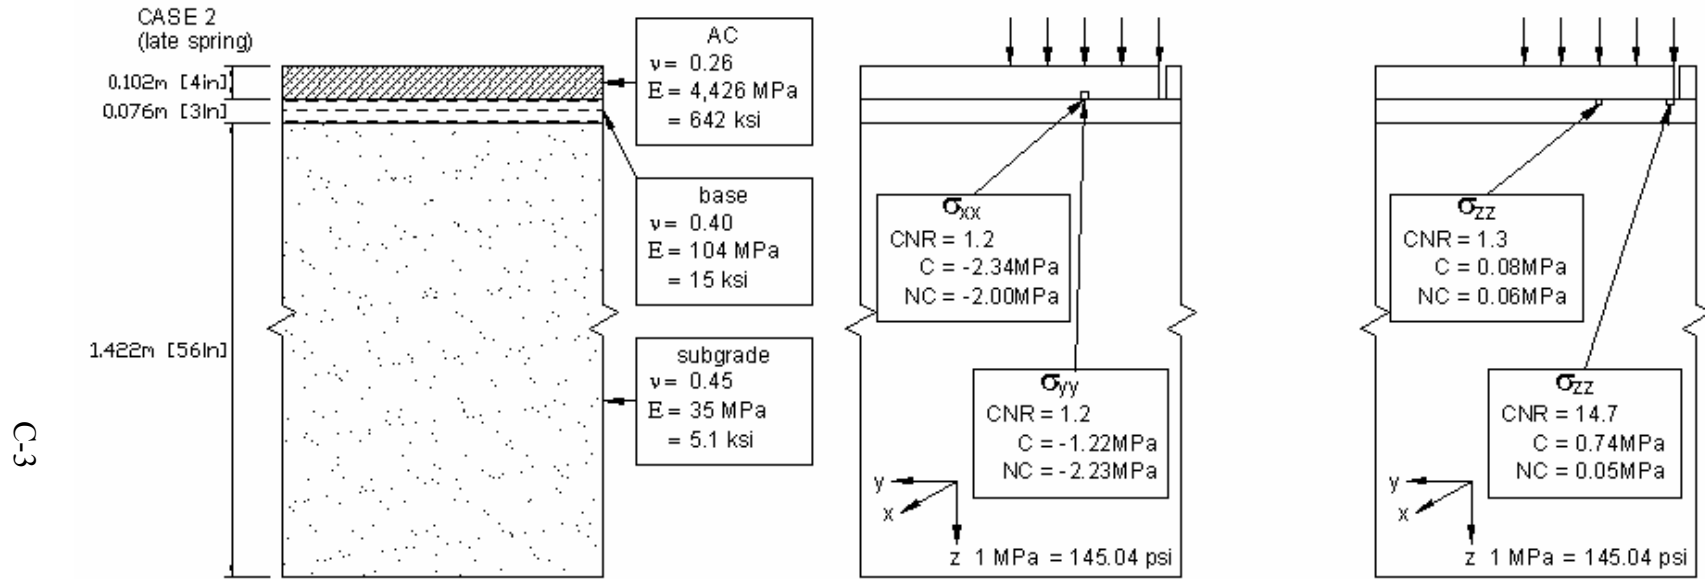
Summary cross section for case 2, (C – stress in cracked pavement, NC – stress in pavement with no crack, CNR – crack/no crack (stress) ratio)
